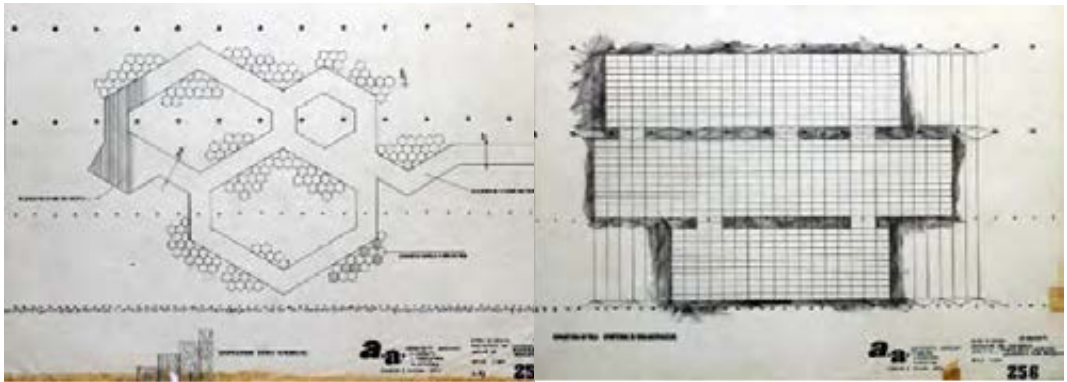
Trade Pavilion stands' plan and roof's plan, first solution_CASVA concession
